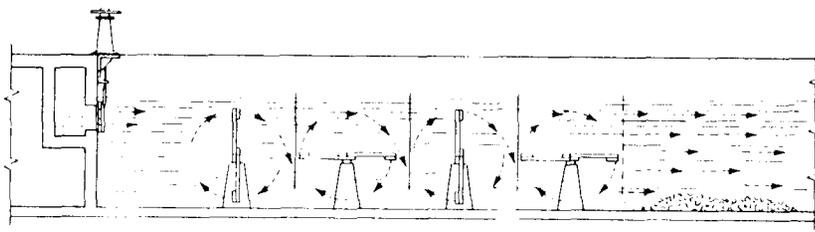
HORIZONTAL SHAFT PADDLE TYPE FLOCCULATOR
